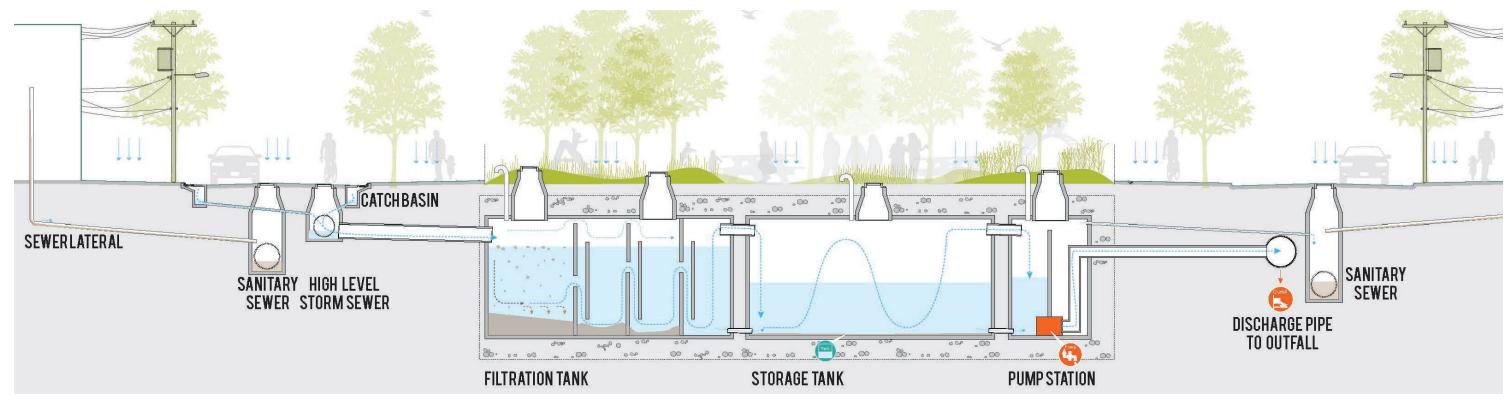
BASF Site depicting tanks and typical "High Level" Storm sewer system
